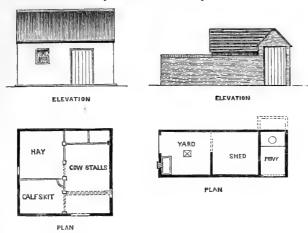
Elevations and Plans of Outbuildings to Cottages on the Estate of Mr. J. D. Allcroft.
